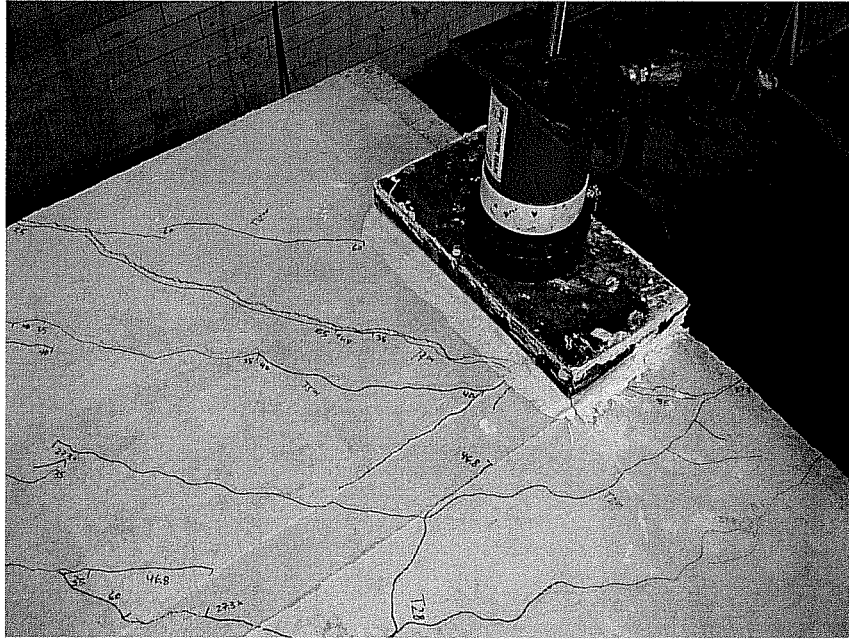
Failure of Overhang Test Area 1, top view, facing southeast
